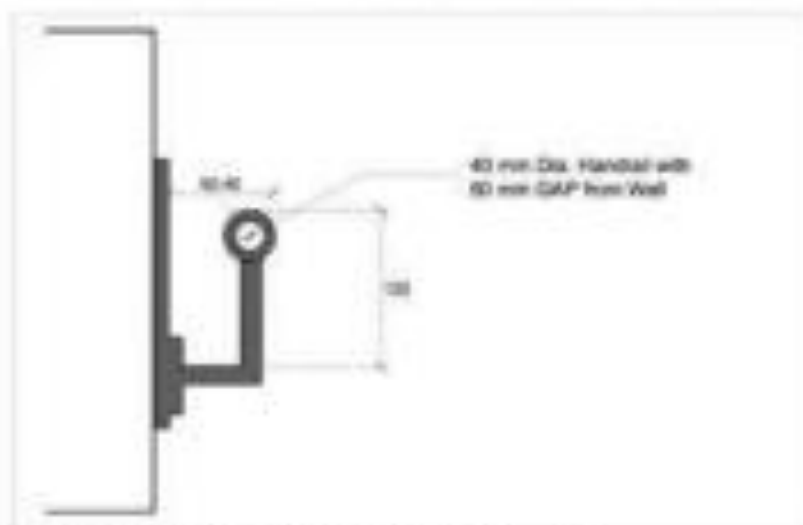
Fitting Detail of Handrail to the Wall
